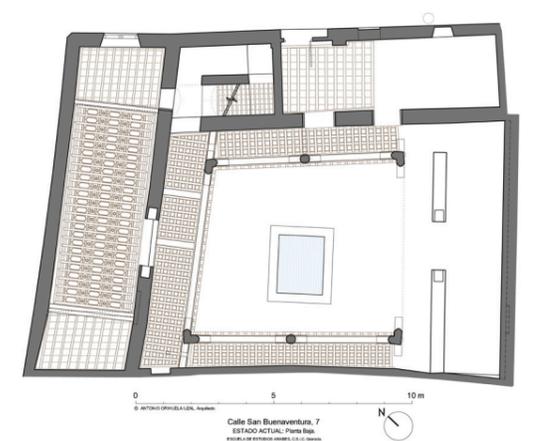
Ground floor plan, with ceiling projection, before restoration. © Orihuela, 2019
